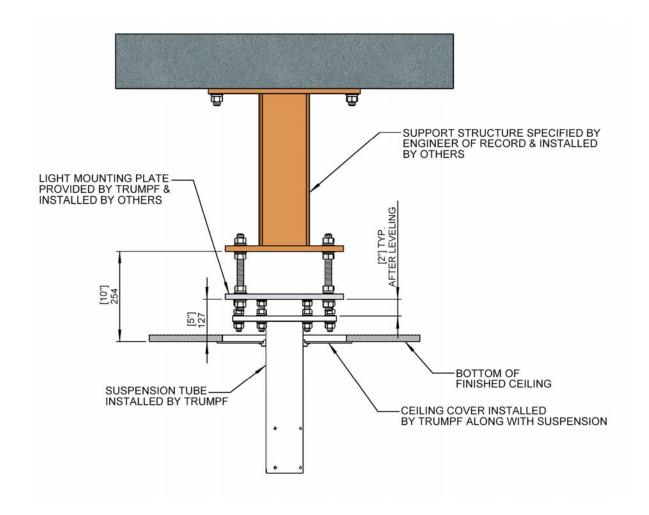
Structural Elevations for Light / Flat Panel with Flat Ceiling Cover
